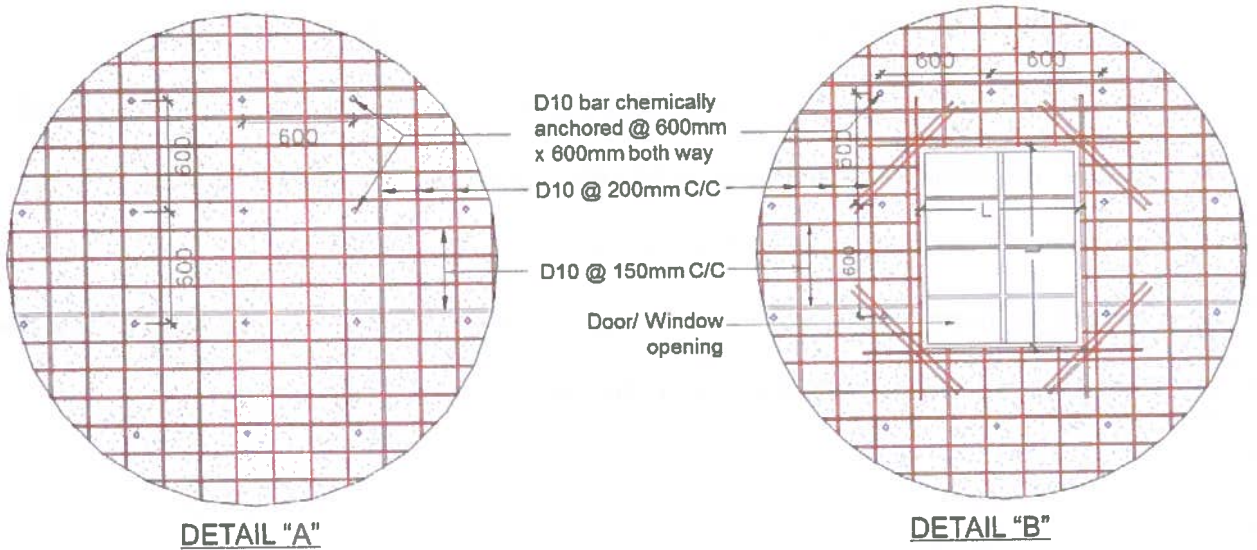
Details RC Lamination (Drawing for Pilot Work of CNCRP Project)
